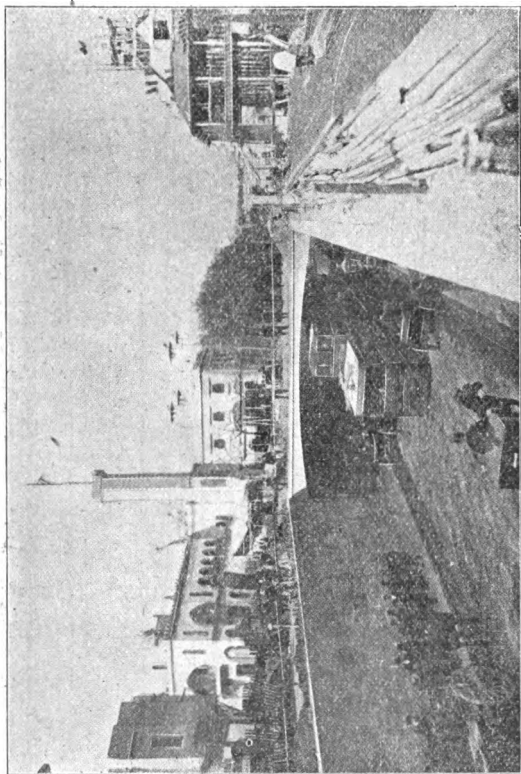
Retaining Walls and Arched Bridge, Paris, France.
